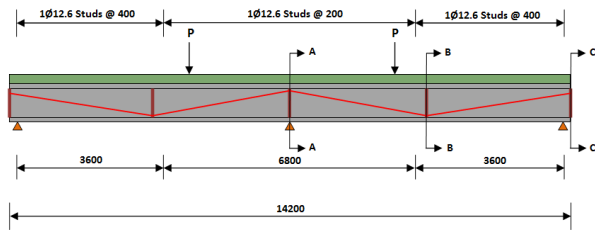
Loading configuration & dimensions of the test specimen(all dimension in mm)
